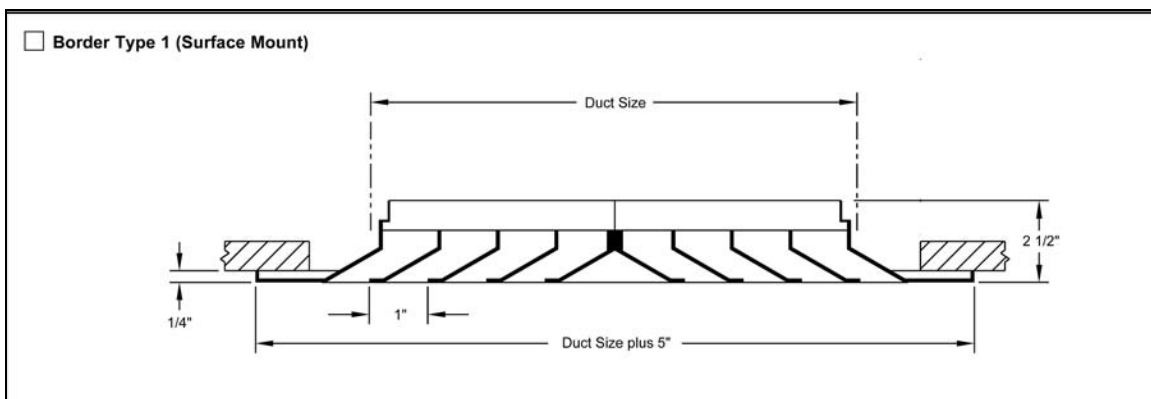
Detail Cross Section of 4-Way Ceiling Diffuser
